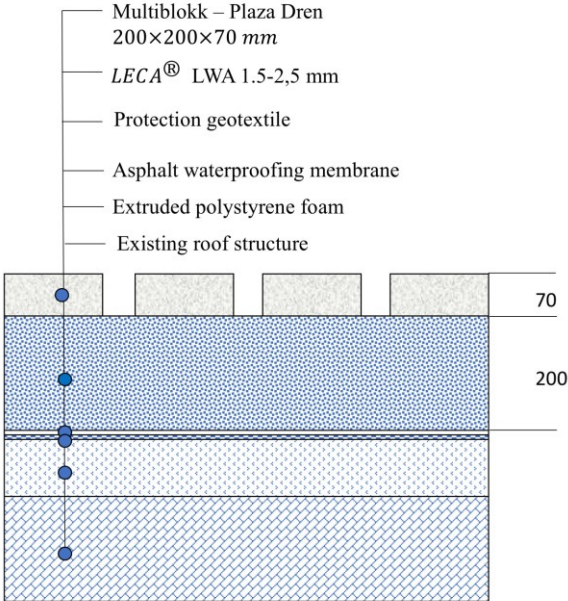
Configuration of the grey roof from cross-section, consisting of three layers: Top pavers, underlying Leca and water-proof layer.
